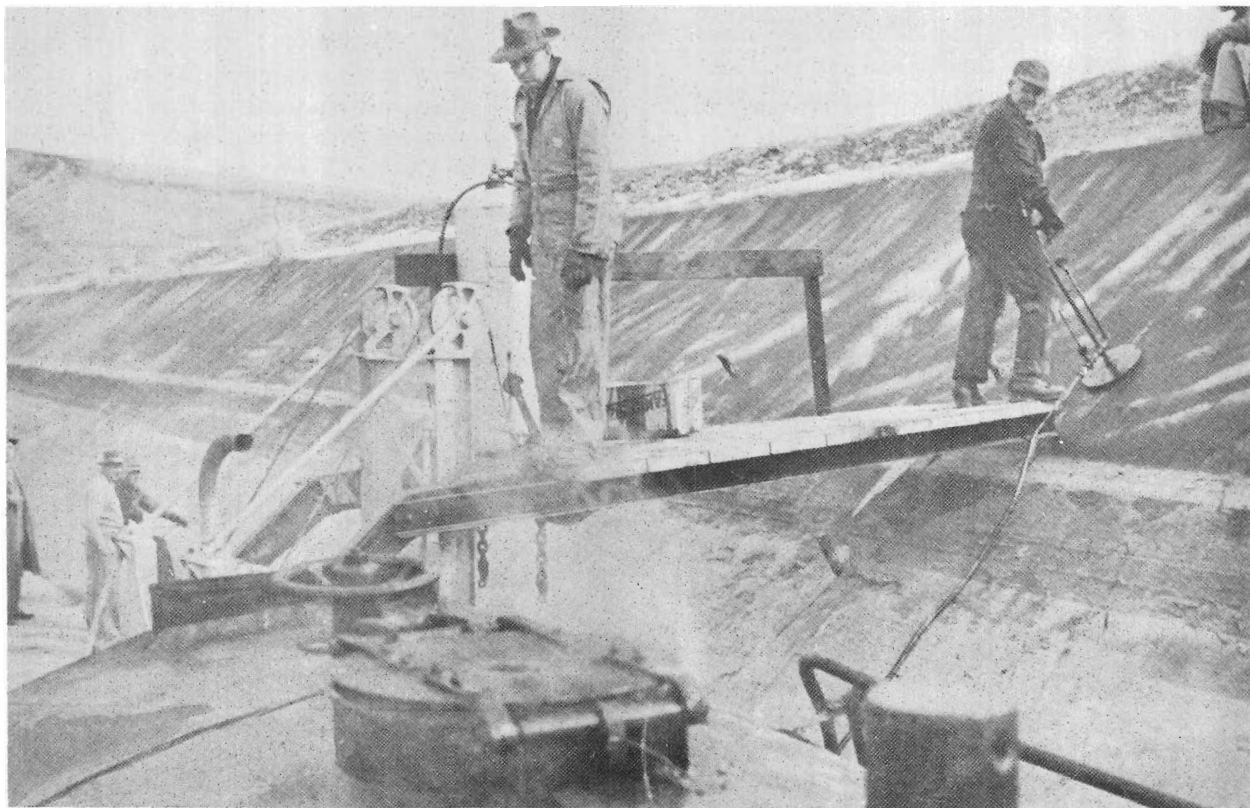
Asphalt undersealing of the concrete-lined Yakima Ridge Canal, Yakima project, Washington. P33-D-14664, March 1950.
